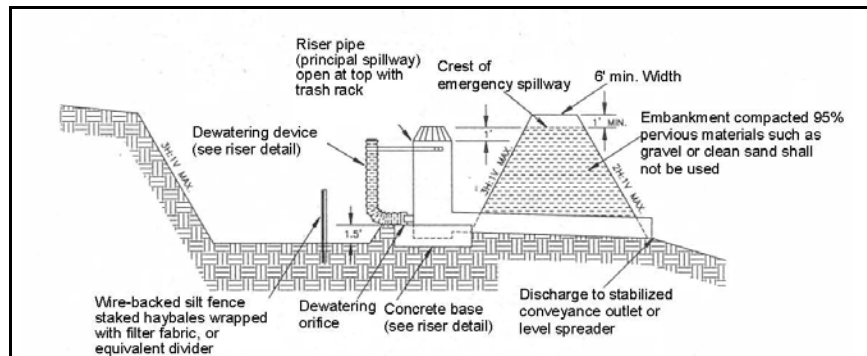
SEDIMENT POND CROSS SECTION
